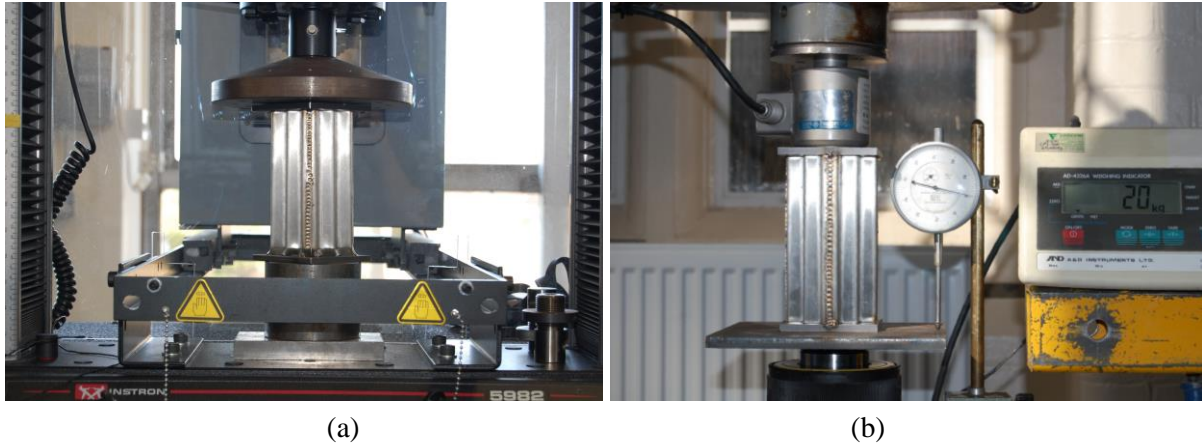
Experiment settings: (a) Instron machine, and (b) hydraulic machine.
